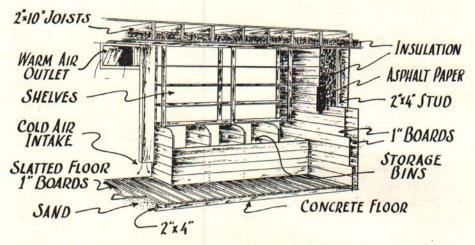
If available, a well ventilated and insulated basement storage is the most convenient place in which to store vegetables.
